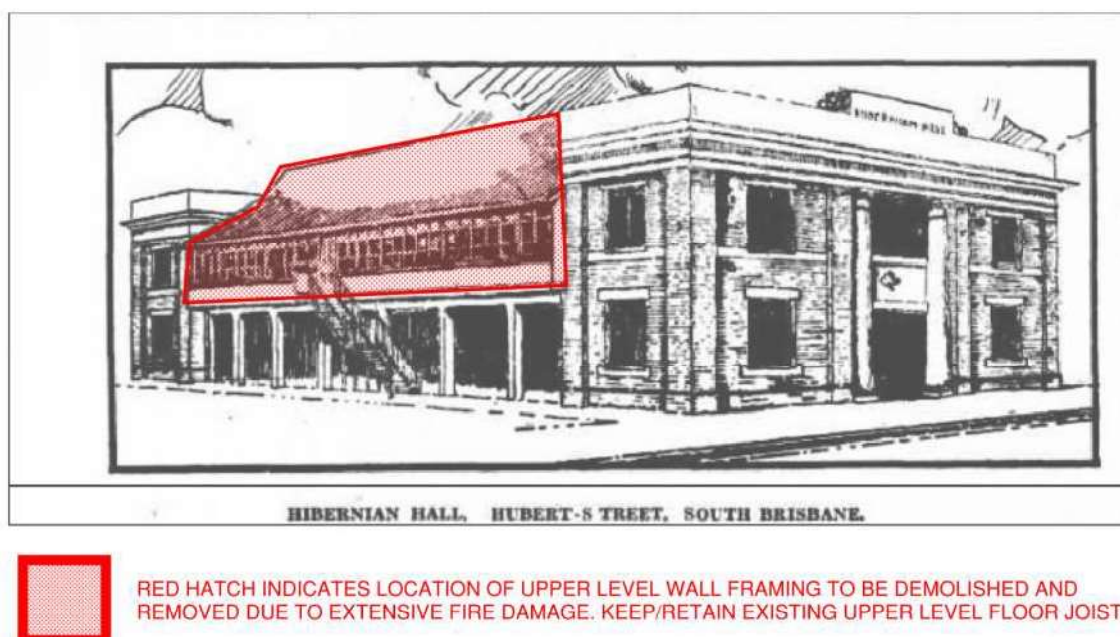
Illustration of the South Elevation, Hatch Indicating Extents of Wall Framing to be Demolished.
